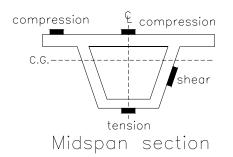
Strain Gage Locations for Bending Test on Trapezoidal Section
